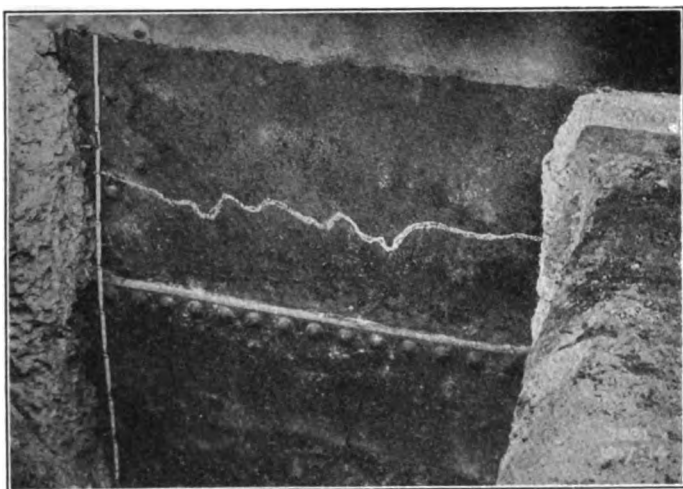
Holder tank plate of open hearth steel with portion of concrete wall removed. Holder built in 1902.
